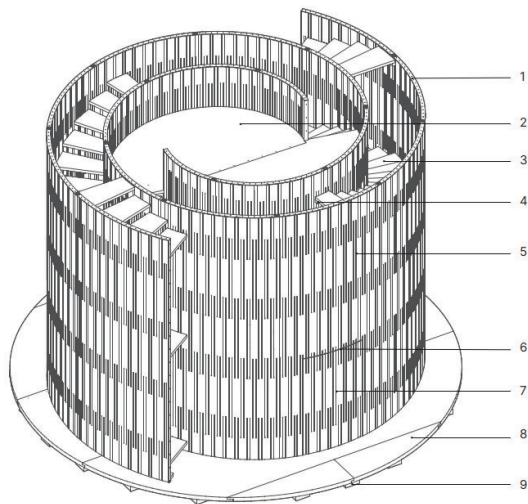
Axonometric view of the Nautile Sylvestre pavilion – 1. Metal plate at the head of CLT walls assembled with splice joints / 2. Slab with CLT 60 mm assembled by lap joints / 3. Stair steps with CLT 60 mm / 4. Supporting joist for steps / 5. Bent walls with CLT 60 mm / 6. Curved door in metal frame / 7. Invisible locksmithing elements / 8. Base plate with CLT 90 mm / 9. Support wedges 300 x 300 mm
